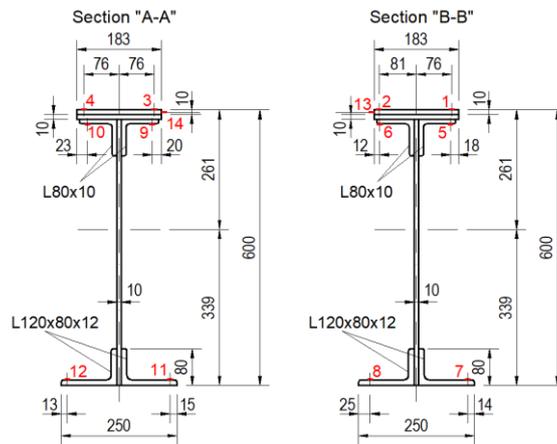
Sections of the longitudinal girders and points of placement of the strain sensors
